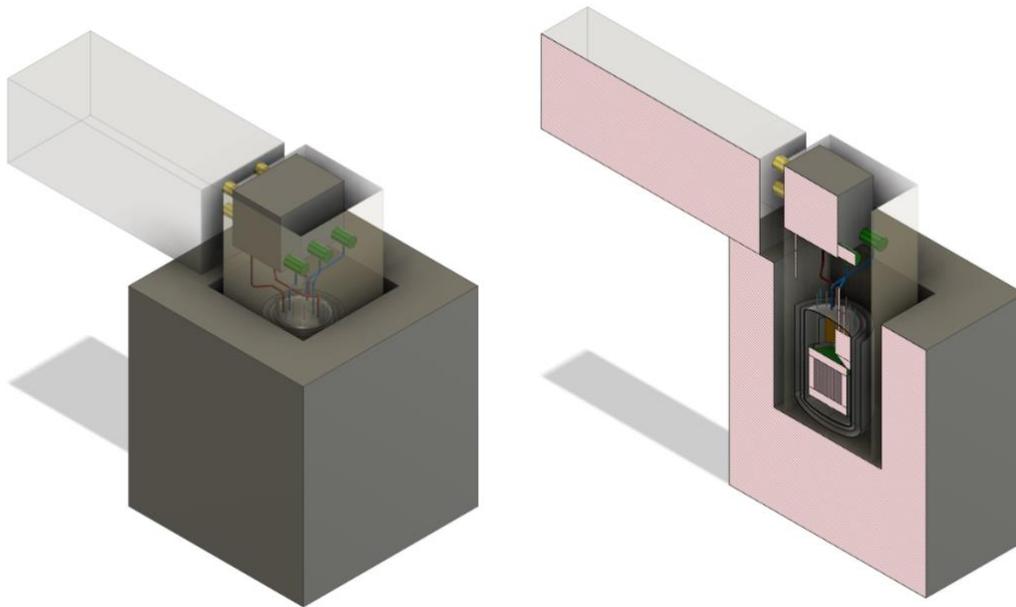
System overview with concrete base and separate containers (*left*) and cross section (*right*) of the system showing the reactor below grade inside the concrete pit. Not all dimensions are final or to scale.
